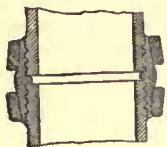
Sleeve-Joint with corrugated Pipe-ends and cast-Lead Ring.
